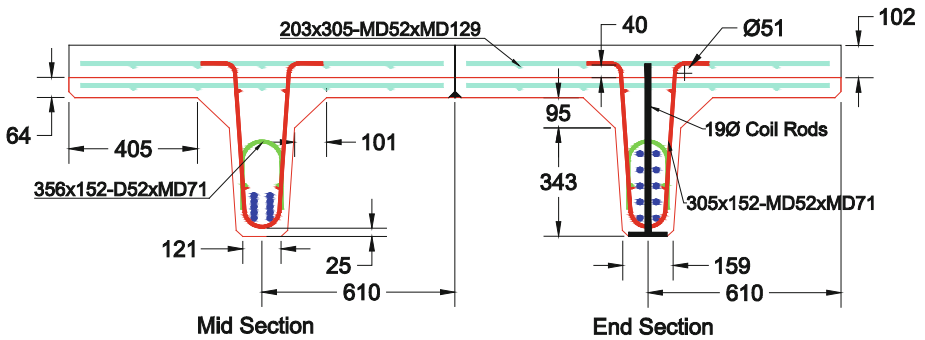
Test specimen cross-section, left stem: midspan detail, right stem: end detail
